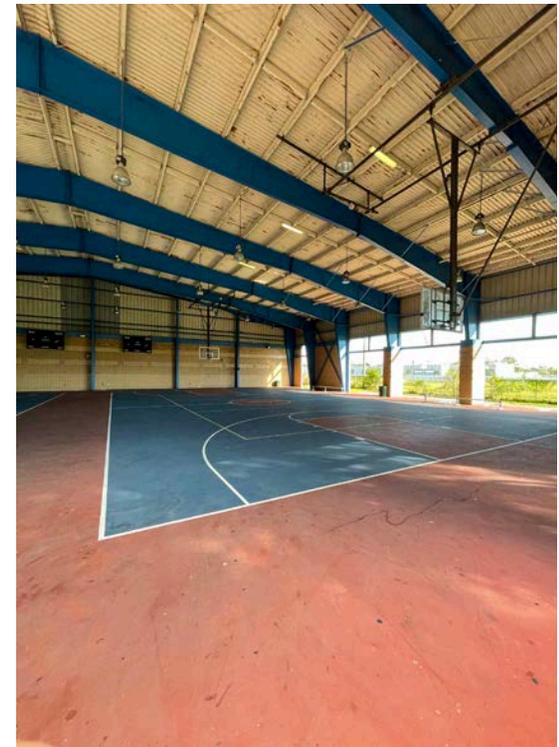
ROBY GEORGE PARK EXISTING SITE PHOTOS
